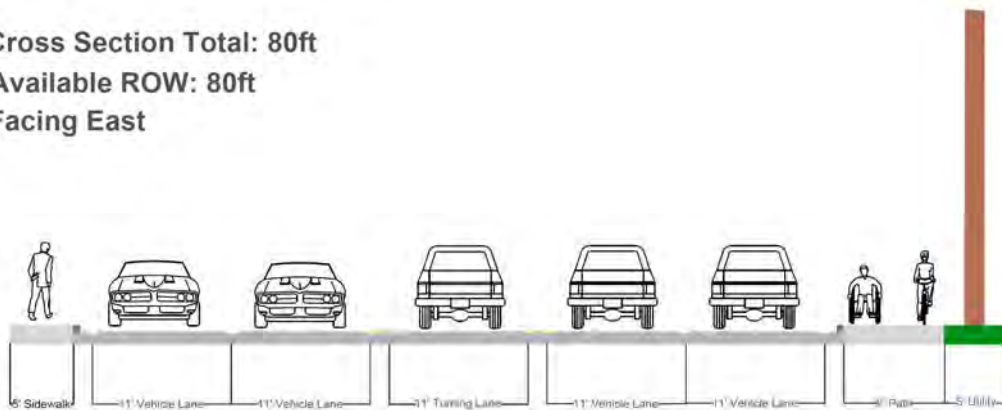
ROUTE 28 CENTERVILLE CROSS-SECTION - OPTION 2C
